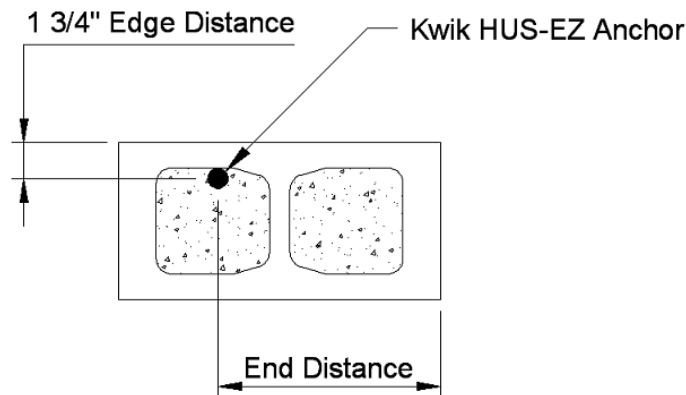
EDGE AND END DISTANCES FOR THE KWIK HUS-EZ ANCHORS INSTALLED IN THE TOP OF CMU MASONRY WALL CONSTRUCTION
